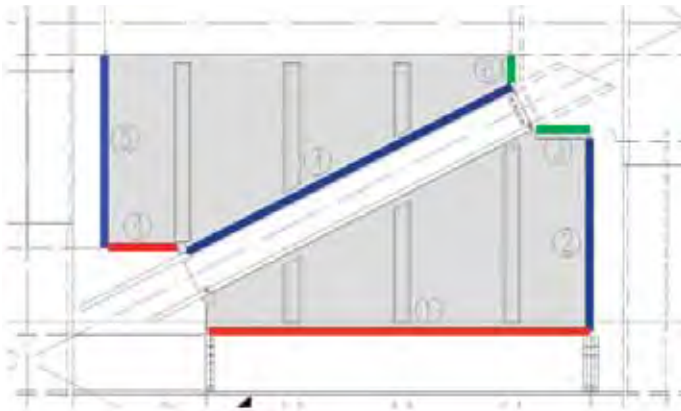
Steel plate wall welding sequence at outrigger truss (source: Yang Yaohui Gao Junfeng & Wang Jing)
